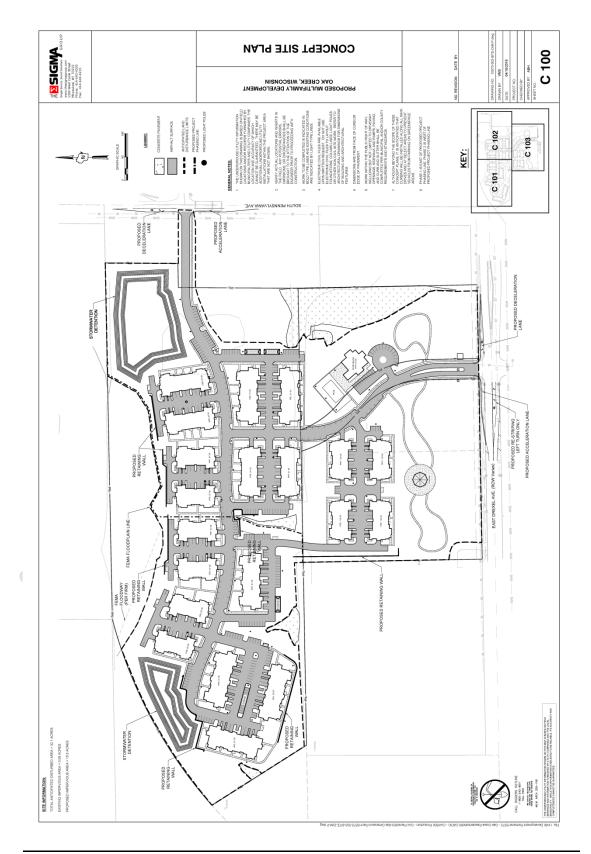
EXHIBIT B: CONCEPTUAL SITE PLAN (COLOR)
